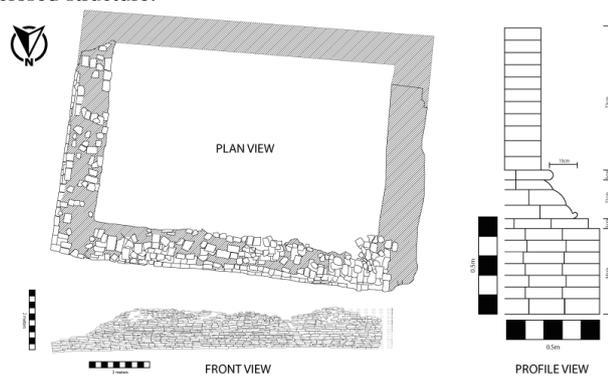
Plan, elevation and profile view of Candi Kampung Baru.
